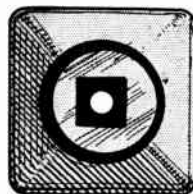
WALL PLATE TO GO ON BOLTS HOLDING WALL BRACKETS.
